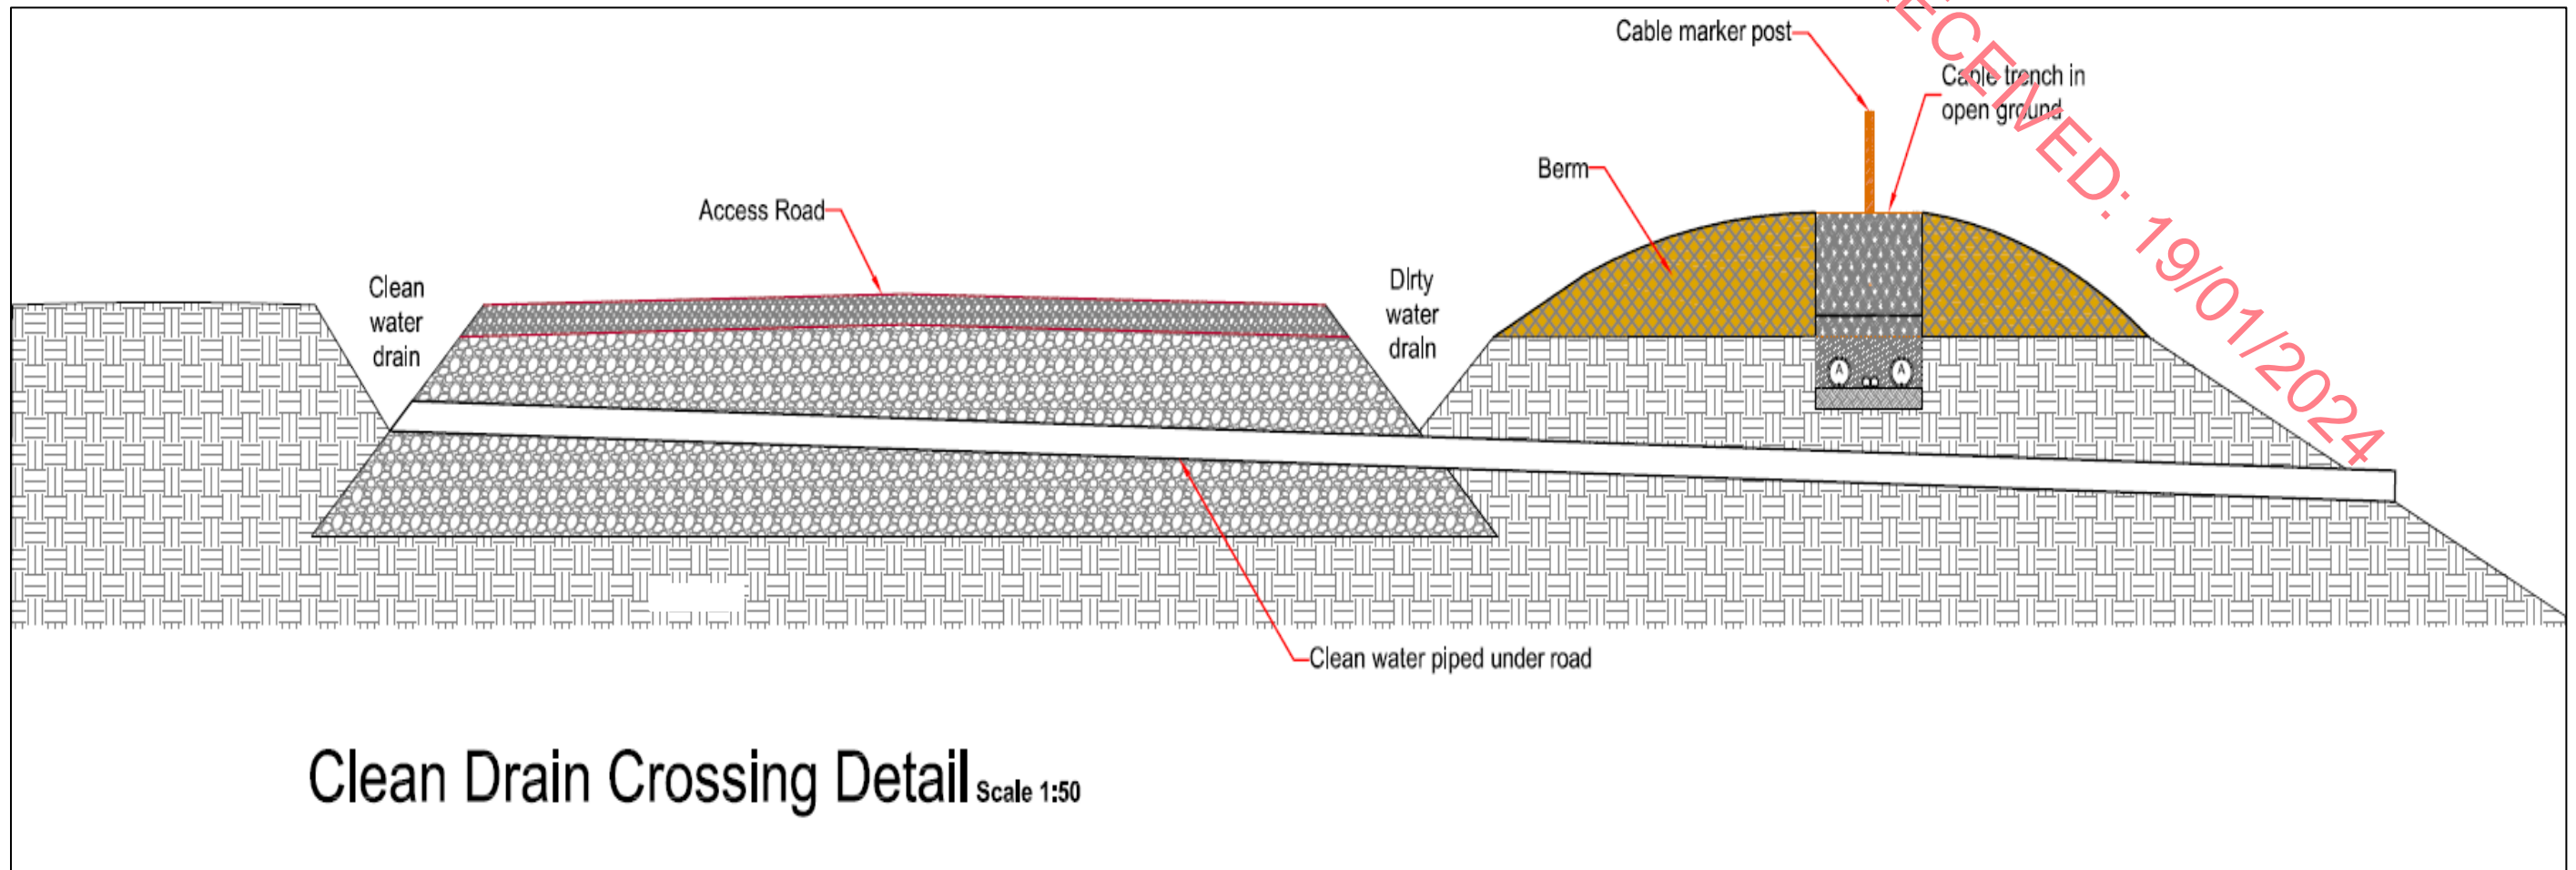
Proposed Road and Trench Sections and Drain Crossing Details.
